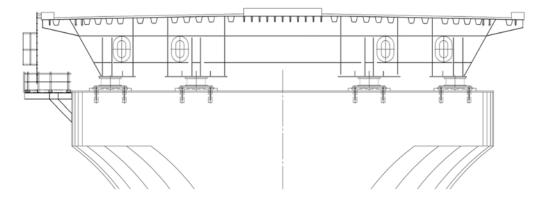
Fall Preventive Handrail at Pier Top
